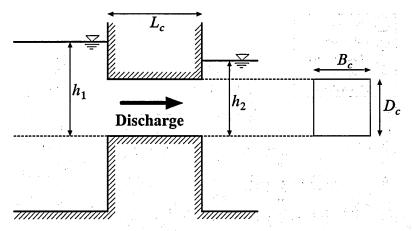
Sketch of the box culvert at the connection branch between two tanks.
